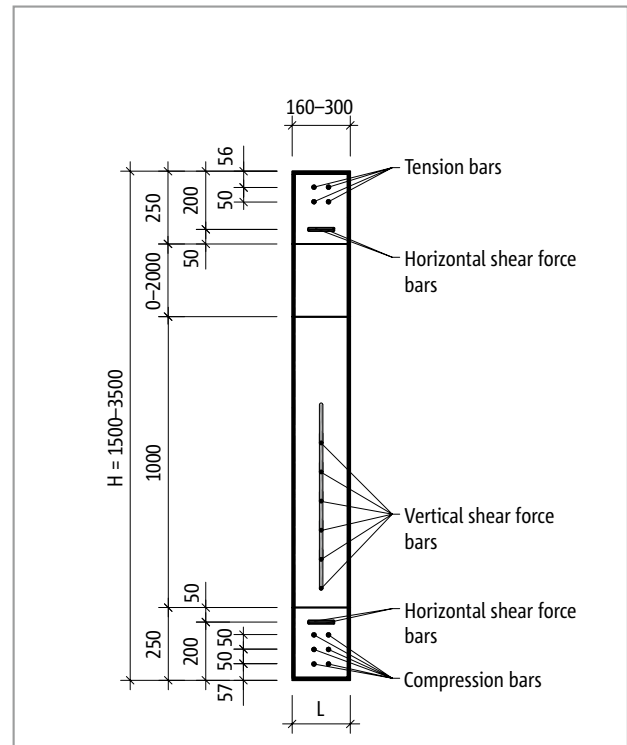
Schöck Isokorb® XT type W-M4-R90: Product layout; perimeter fire protection boards
